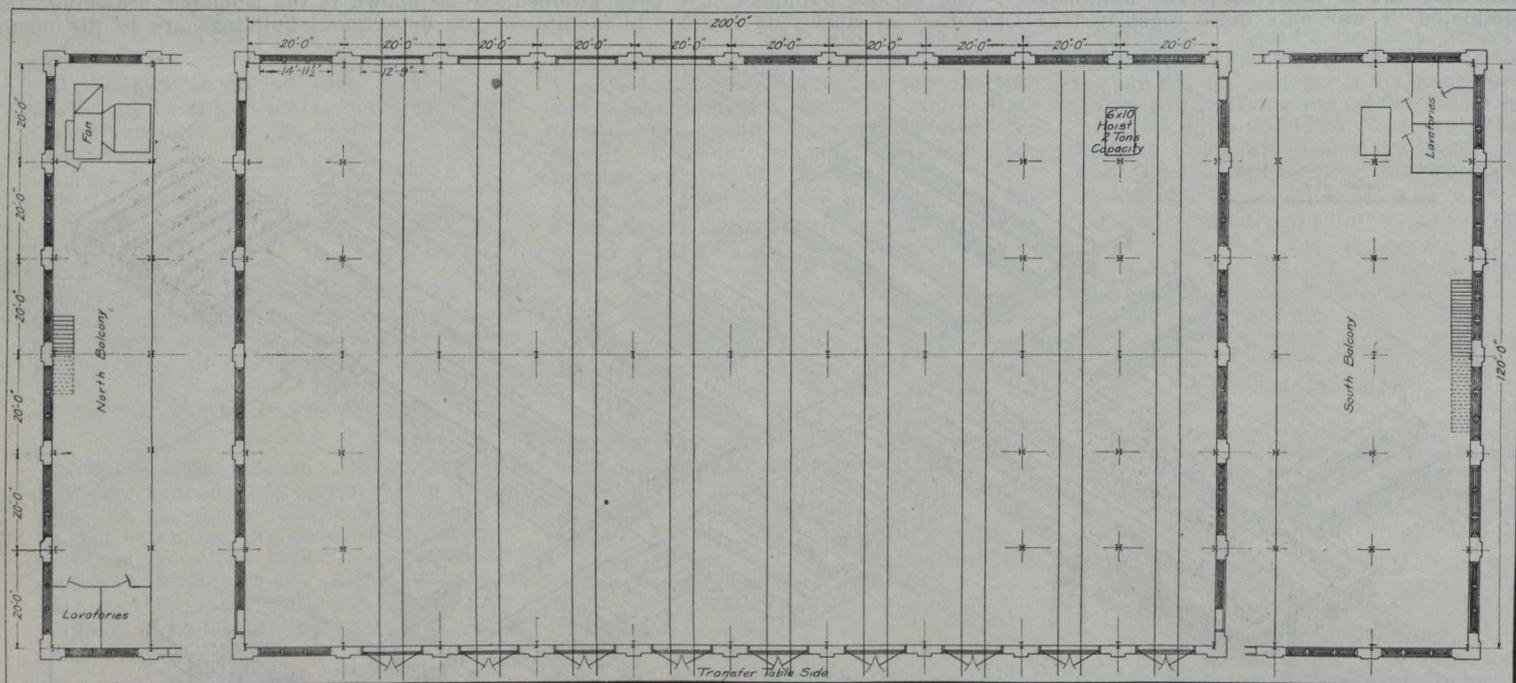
Plan of Main Floor and Galleries of One of the Two Passenger Car Buildings.
